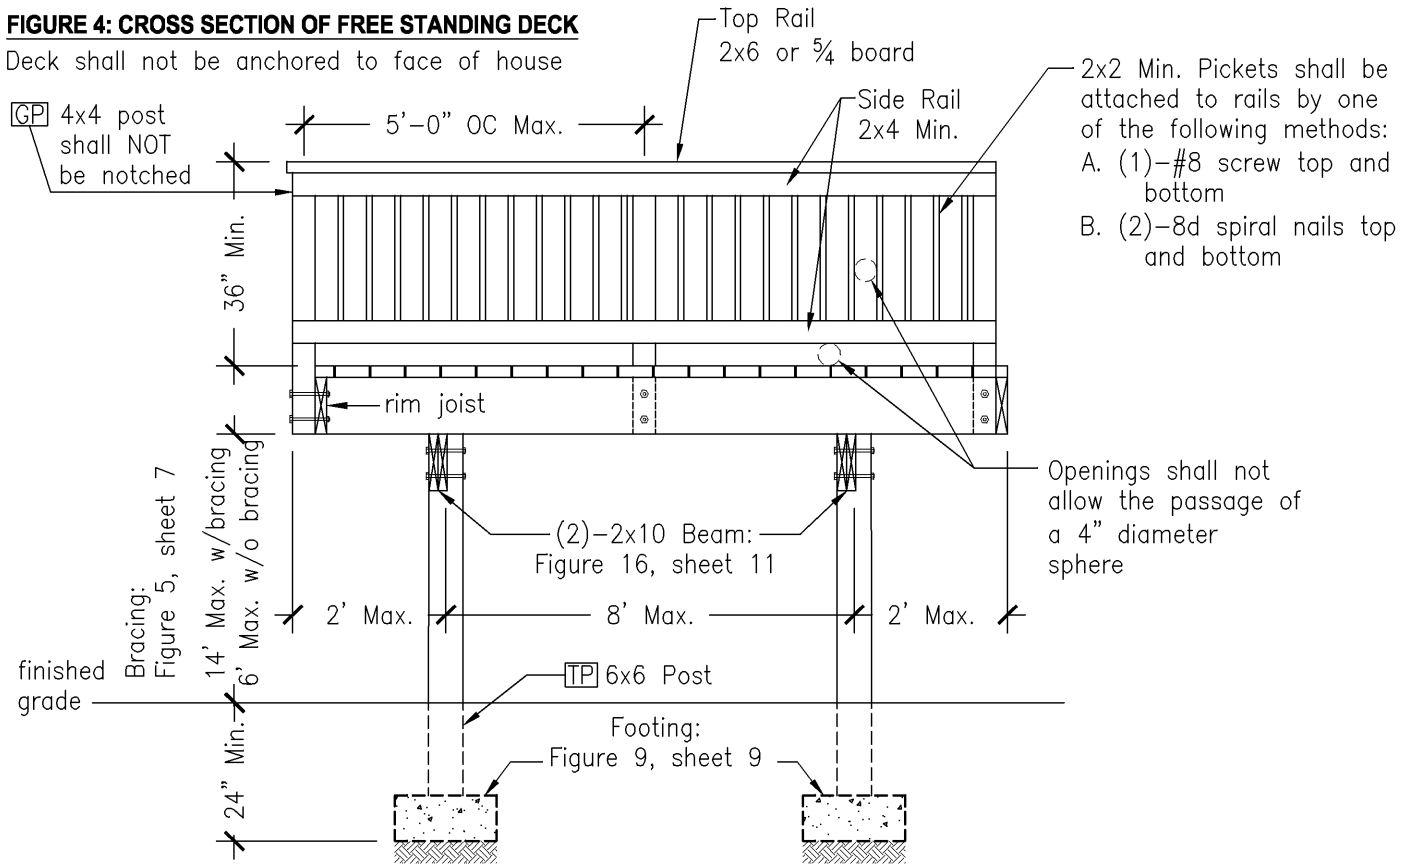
CROSS SECTION OF FREE STANDING DECK
